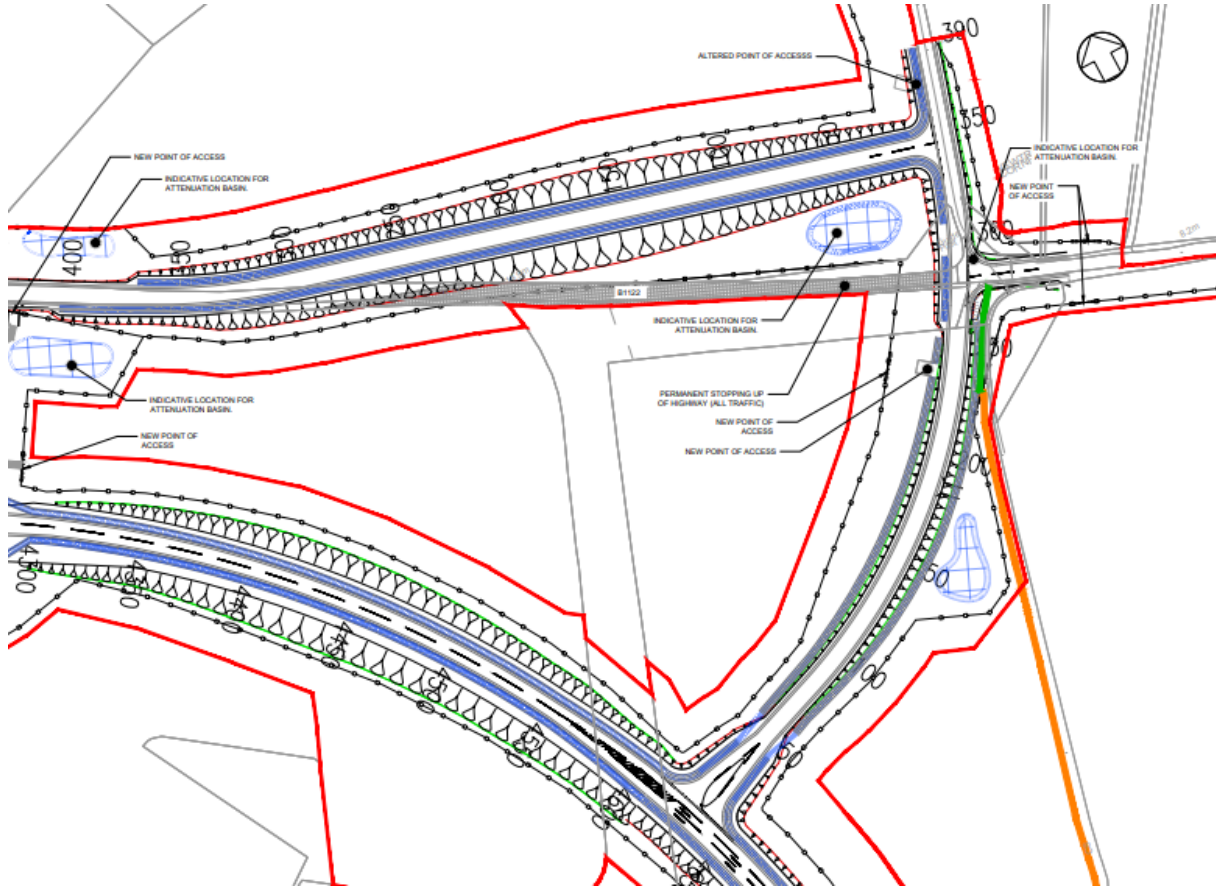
Indicative location of the attenuation basins at crossing 5 (Extract from drawing no. SZC-SZ0204-XX-000-DRW-100059 Rev 02 Sheet 4)
